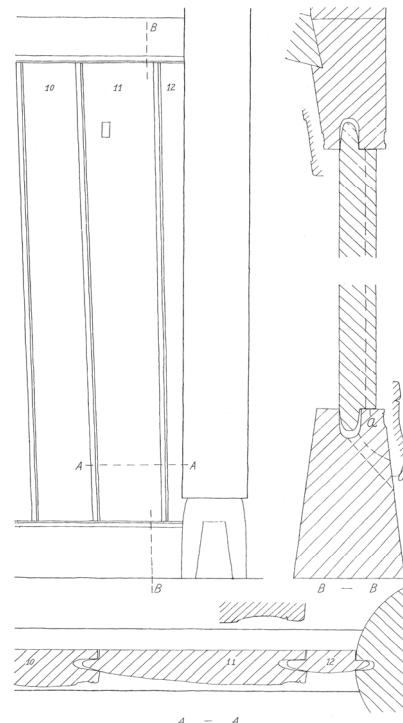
Kaupanger – church from 1180, construction of the skeleton walls. (source: [10])
